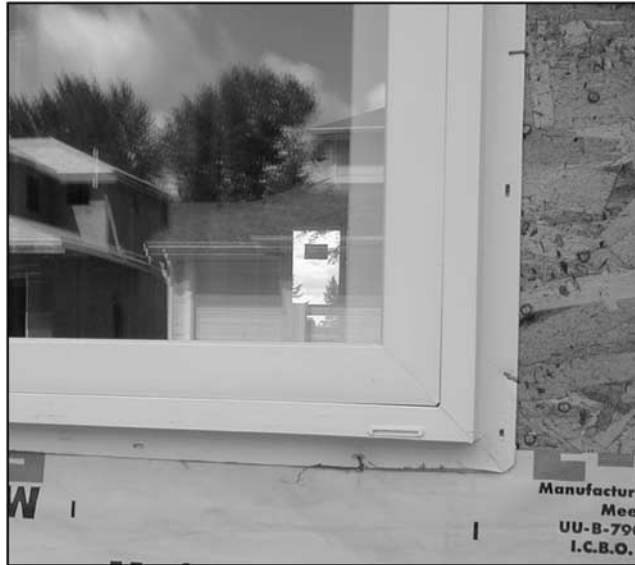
Improper use of staples as fasteners with little caulk.
